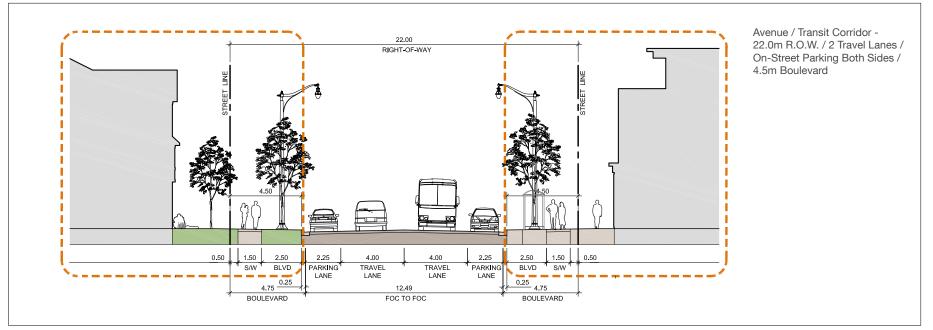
Conceptual cross-section of Neighbourhood Centre Area with building scale and streetscape features that reinforces an active, human-scaled environment.
